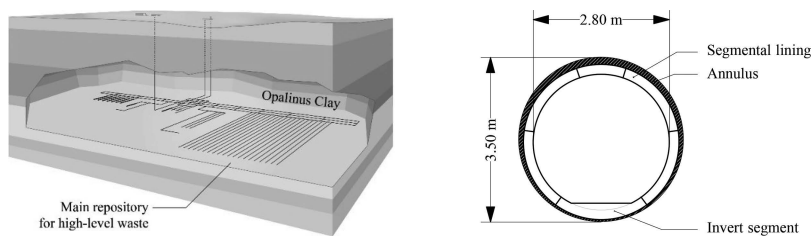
Schematic layout of the underground facility (left); cross section of a HLW drift (right).
